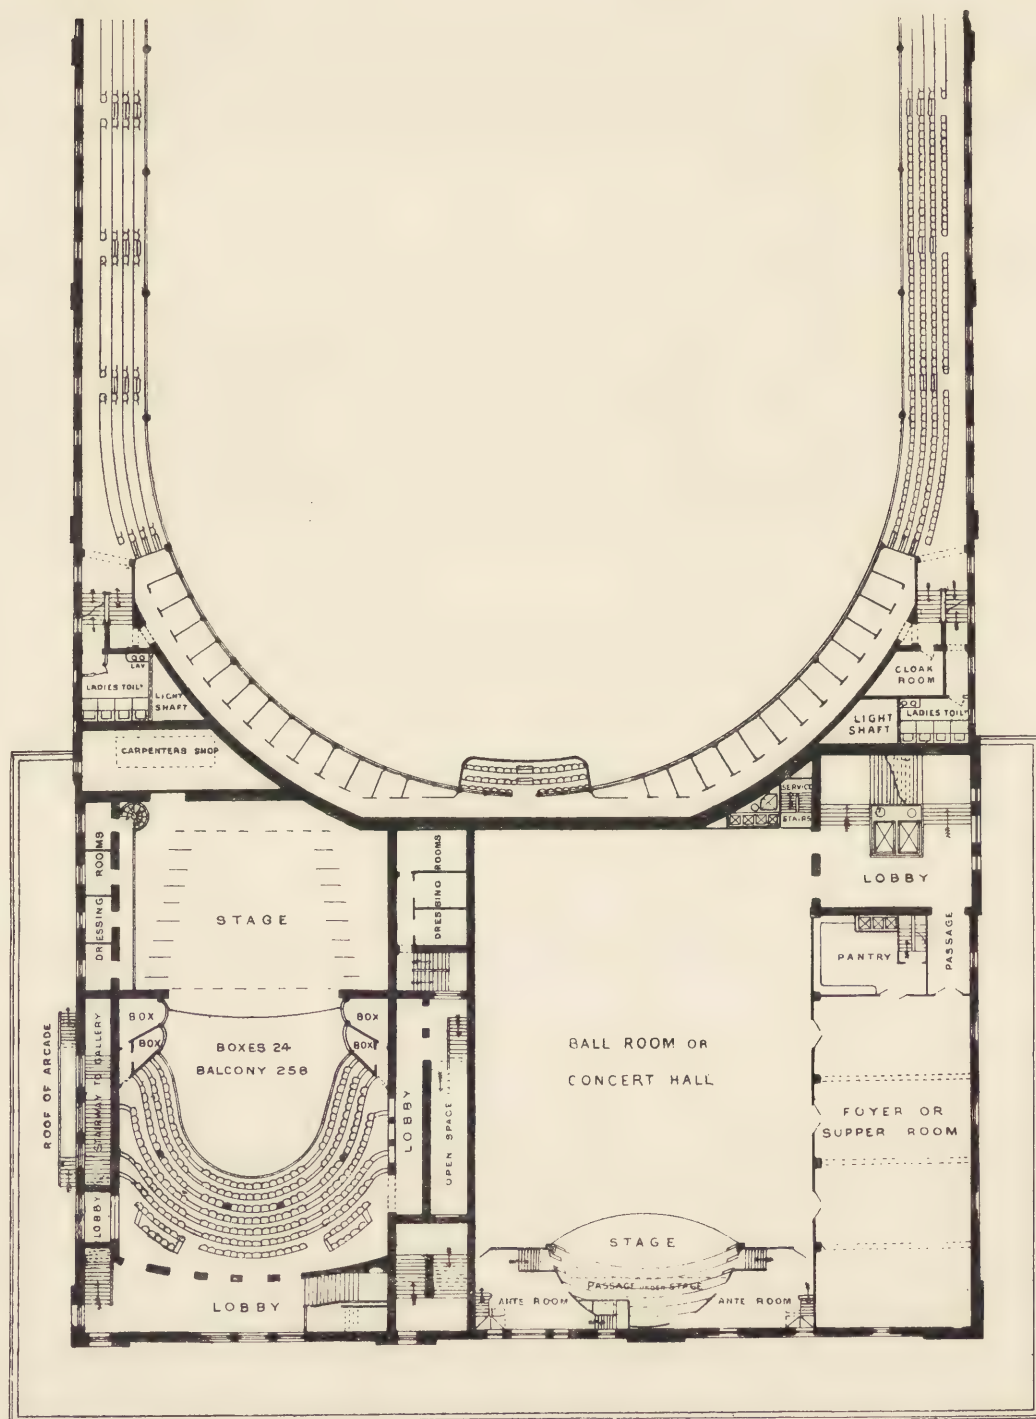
MADISON SQUARE GARDEN BLOCK: PART PLAN OF FIRST FLOOR.
